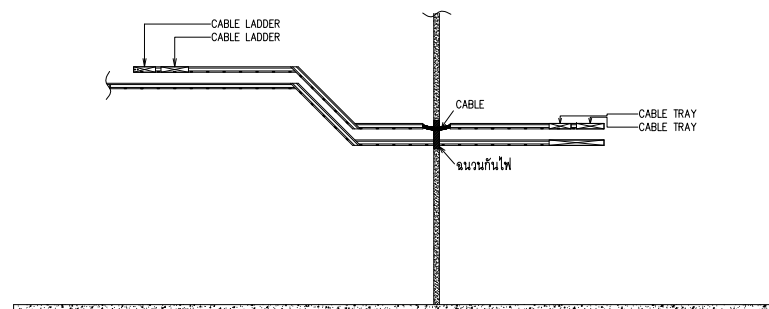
DETAIL OF INSTALL CABLE TRAY UNDER RAISED FLOOR
